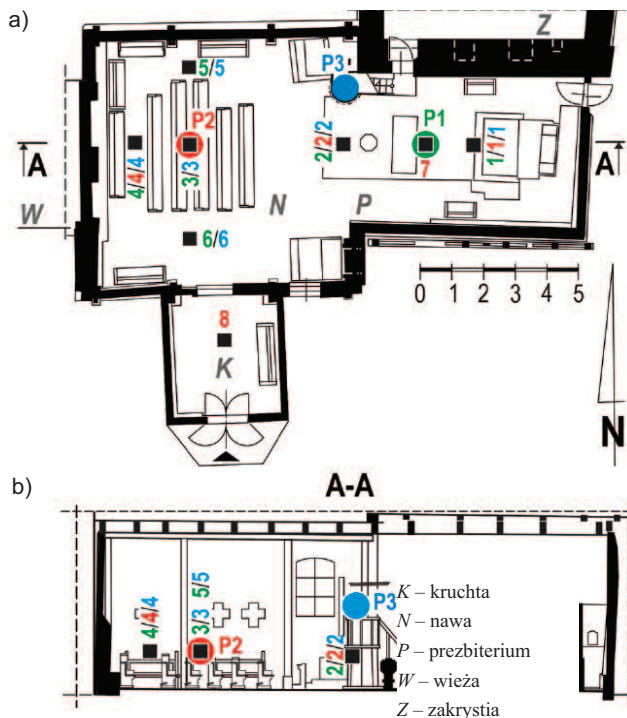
Plan (a) and cross-section (b) of the tested interior with the location of sound sources (sound source in positions P1-P3) and measurement points (microphones 1-8)
